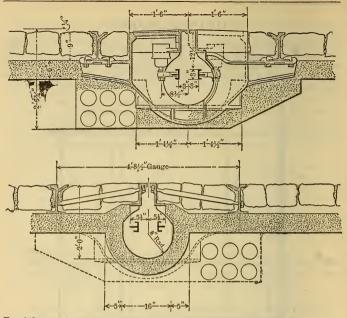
CROSS SECTIONS OF UNDERGROUND CONDUIT CONSTRUCTION, NEW YORK.
